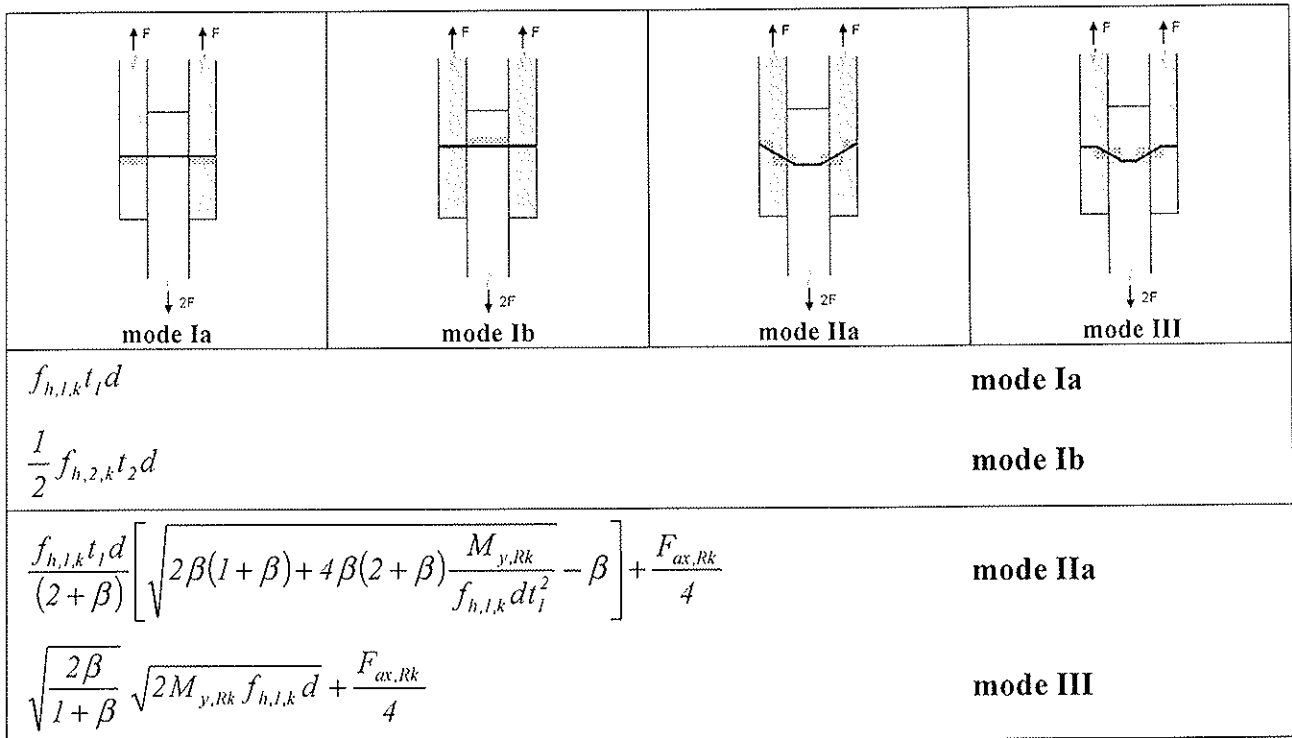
Failure modes of timber-to-timber joints with fasteners with 2 shear planes and related EYM design equations
